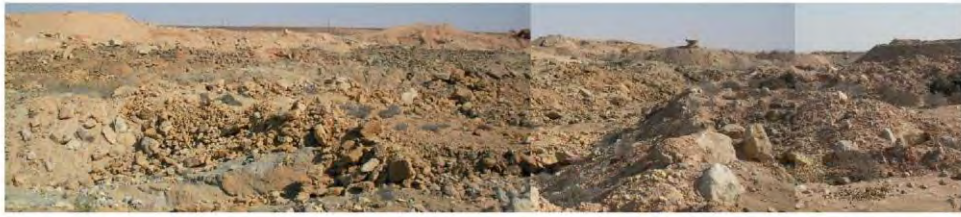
14 Ha Excavations to be profiled by means of dozing
